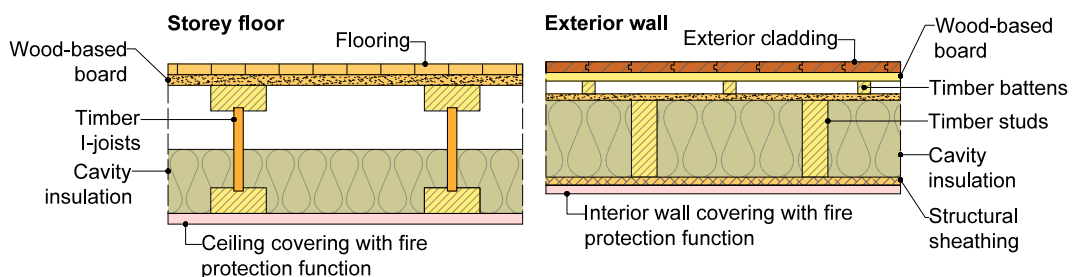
Cross-sectional details of floor (left) and wall (right) light timber frame assemblies with fire protection applied as ceiling or wall coverings. Thin membranes and barriers are omitted for clarity.
